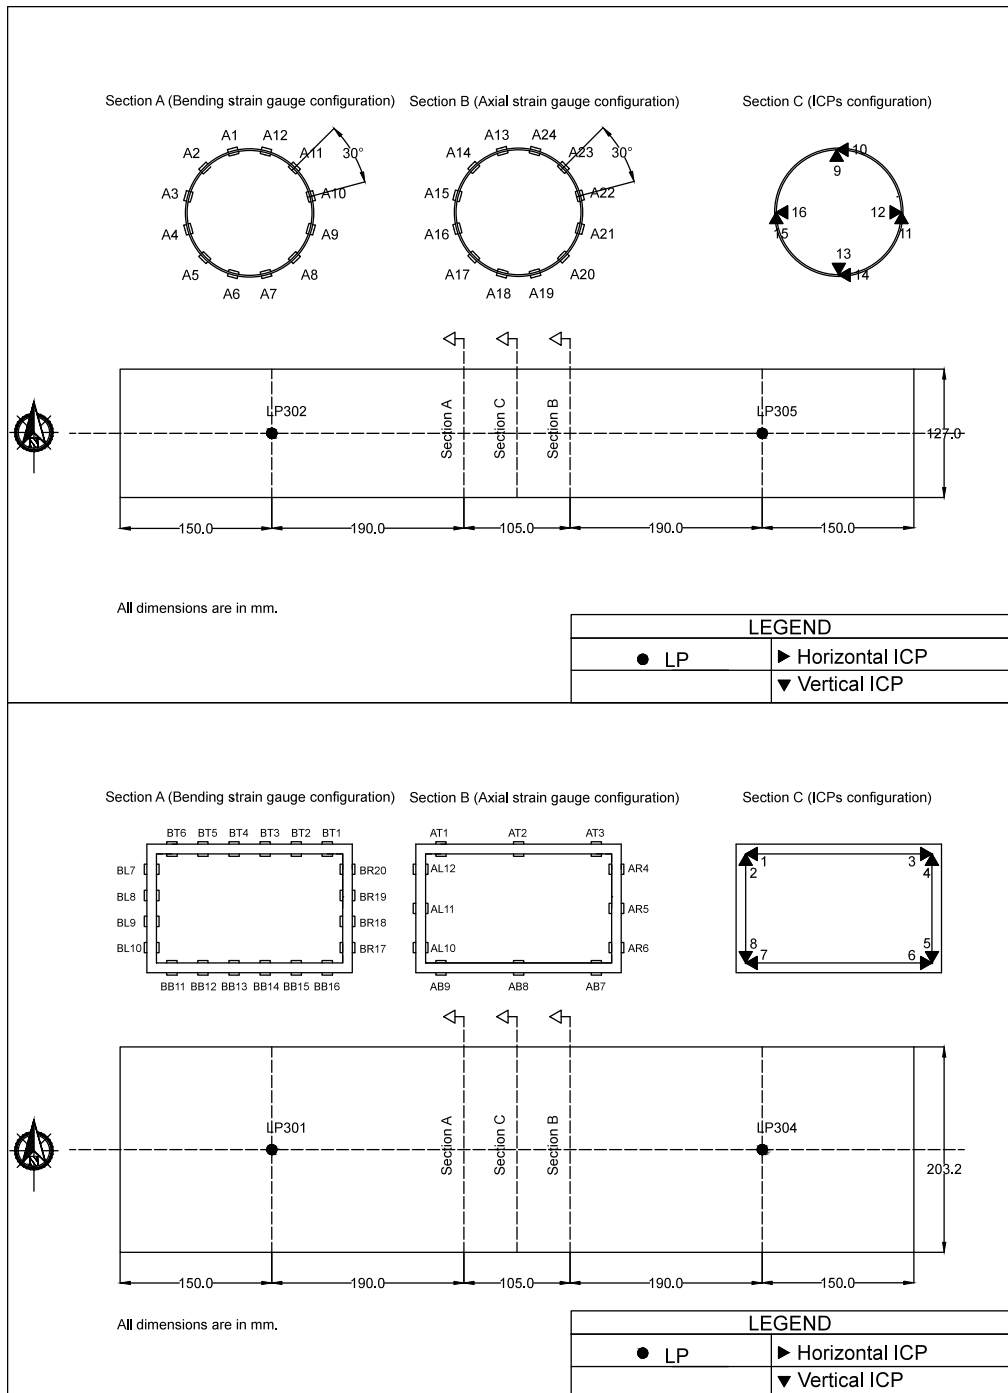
Layout of the instrumentation for the rectangular and circular specimens.
